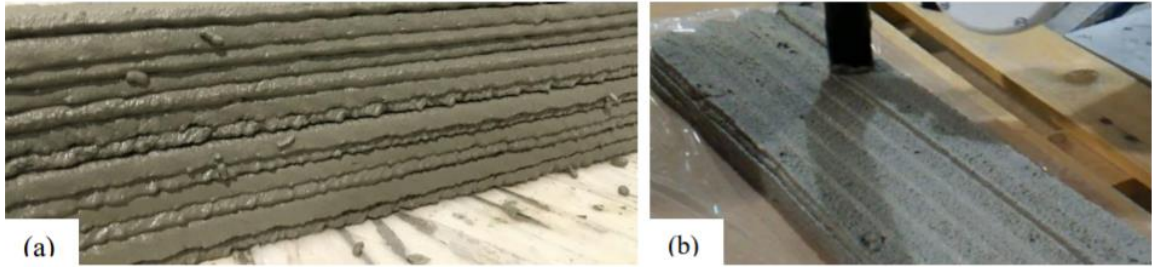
Printed objects created by Paul et al., a) side view and b) top view [16]
